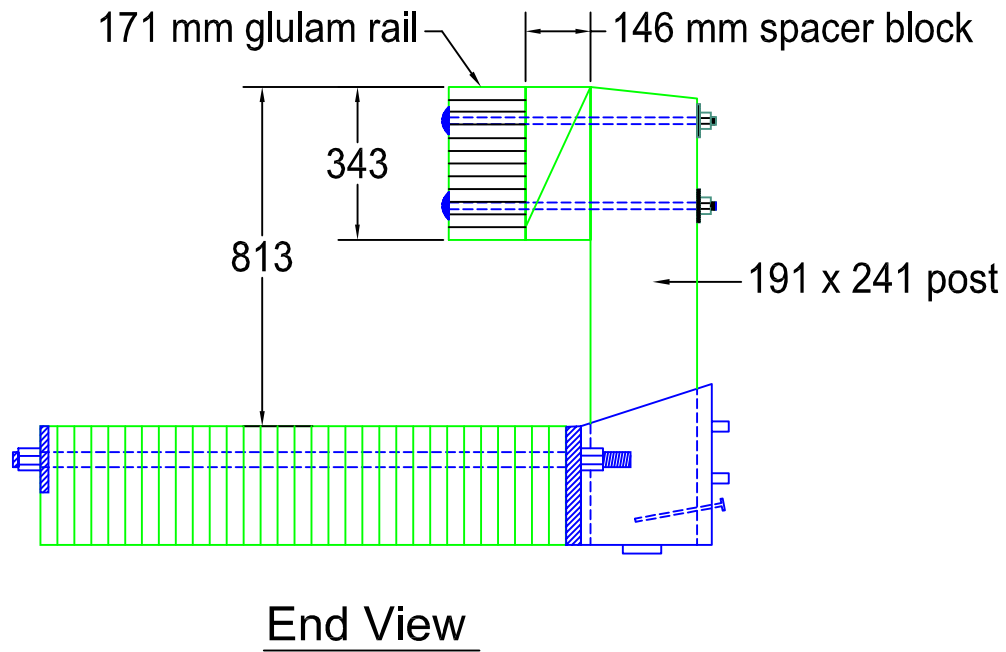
Curb System, Glu-Lam Timber Rail with Curb (102,103).
